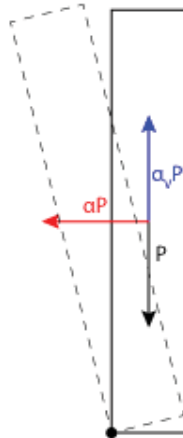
Simple overturning of masonry wall with horizontal and vertical inertial forces
